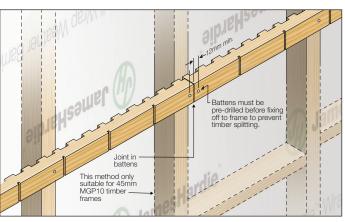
ON-STUD JOINTING OF BATTEN ON 45MM TIMBER FRAMES
